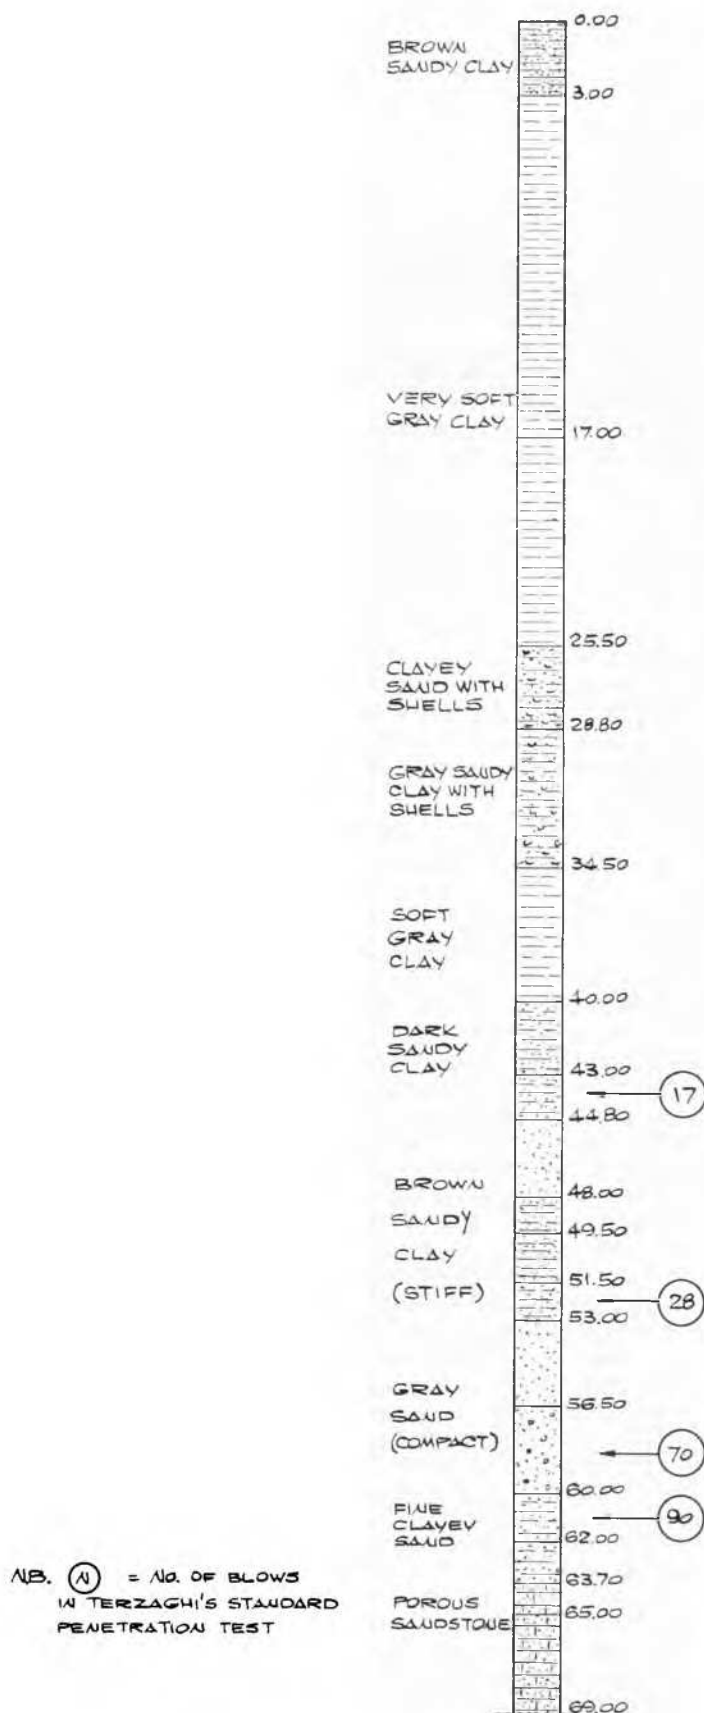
Foundation profile at right bank pier, site of Pile No. 8.
